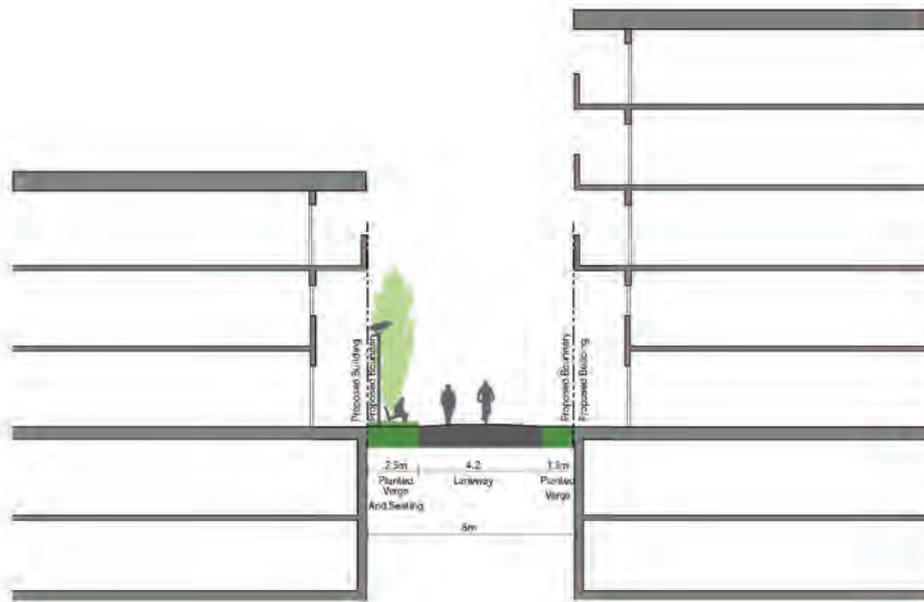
Indicative Street Section (Through site Link, min. 8m)
